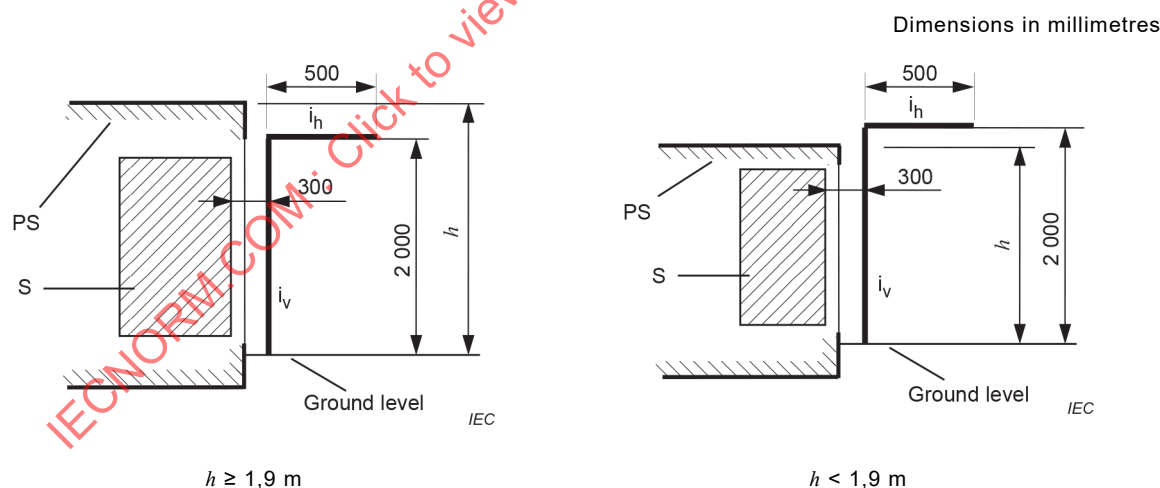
a – Protection of operators in front of the open side of a non-walk-in type prefabricated substation
